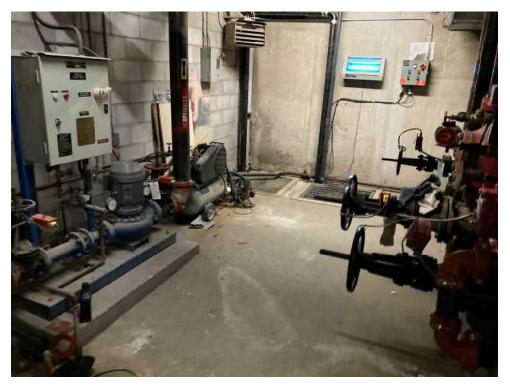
Basement mechanical room showing sprinkler pumps and sump pits
